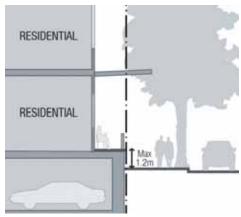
Maximum height that ground floor may be raised above finished footpath level
